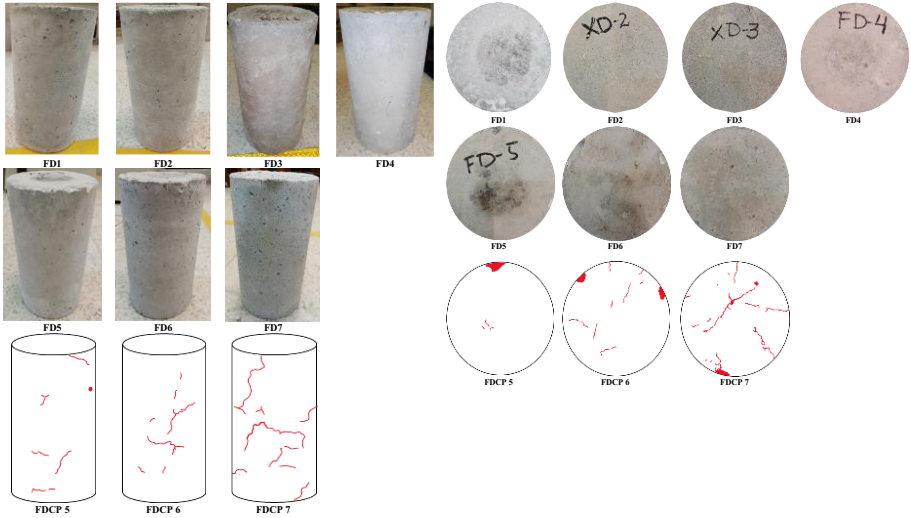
Post fire-damage of cylinders front face and top surface with red crack markings
